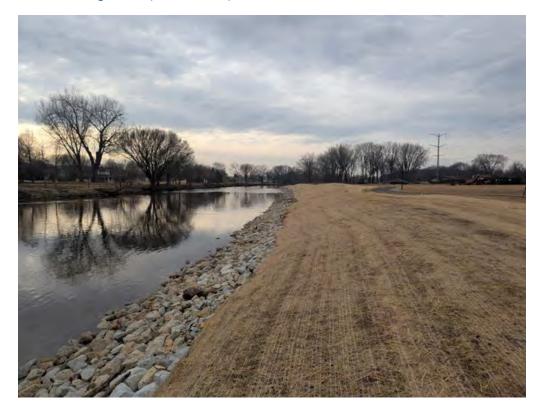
Photograph of the removal of the failed retaining wall of the west bank of the DuPage River (Winter 2025)
